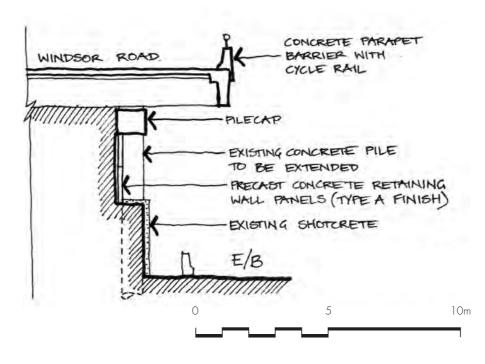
Type A Retaining Wall at Windsor Road Overbridge
